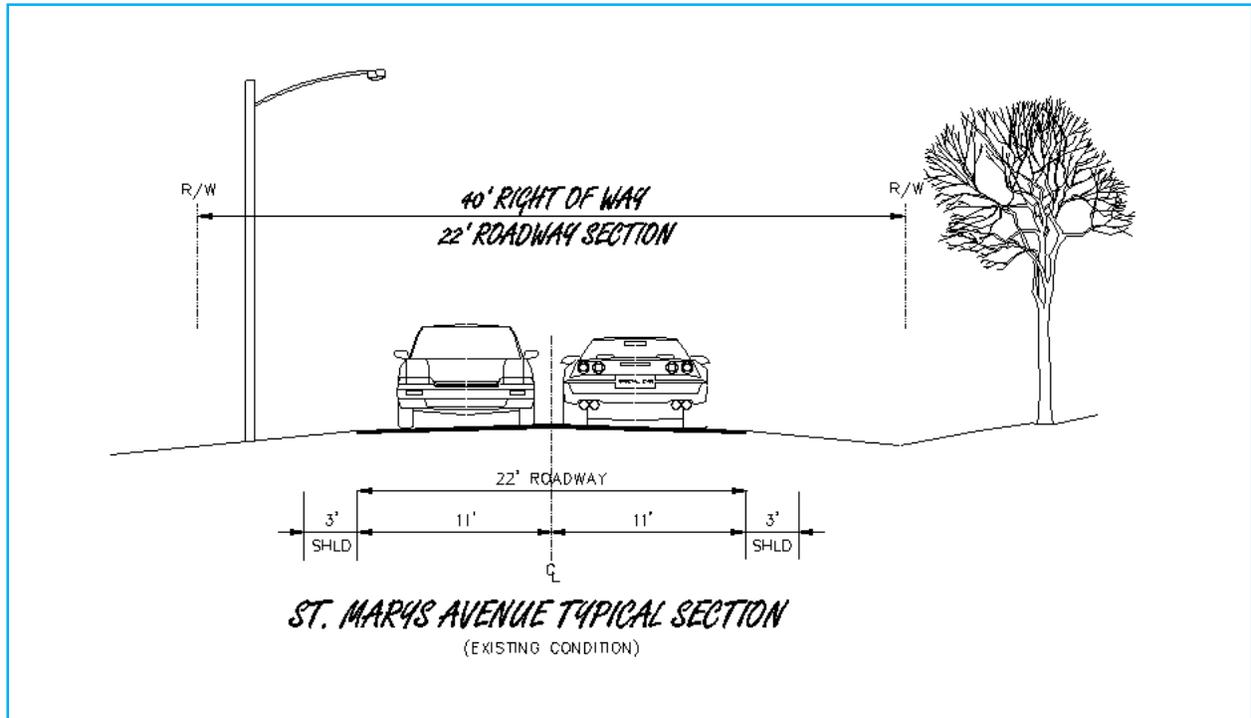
8: ST MARYS AVE. TYPICAL SECTION – 40’ R/W – 22’ PAVEMENT WIDTH
